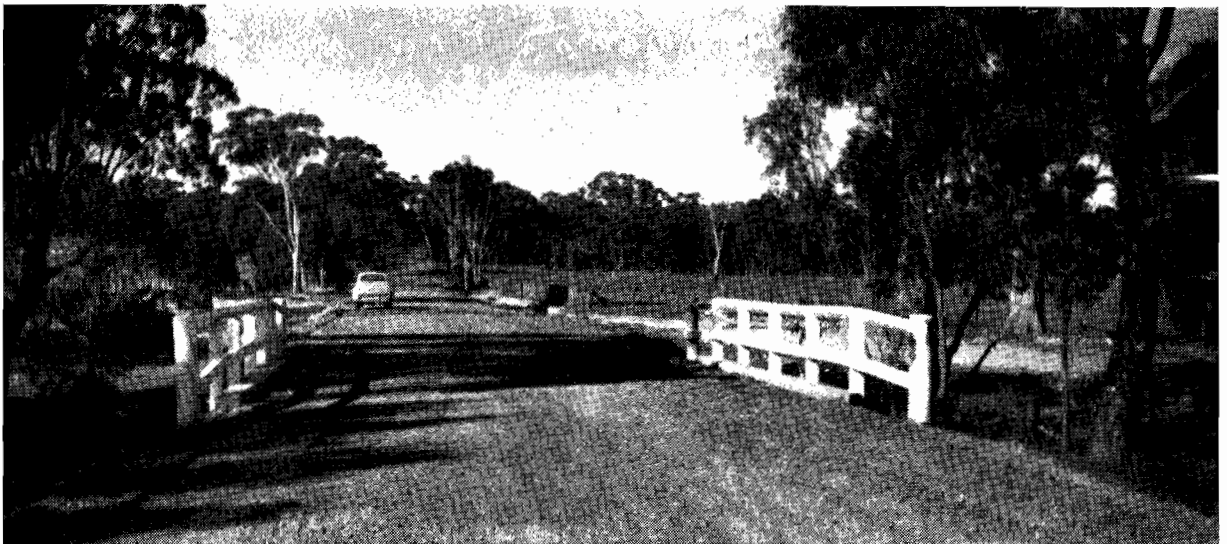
McIvor Shire : Heathcote—Nagambie Road. New steel and reinforced concrete bridge replacing narrow old structure.
